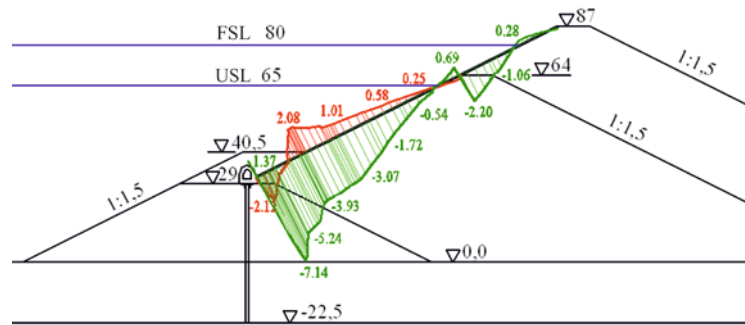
Stresses (MPa) on the upstream face of the reinforced concrete face in the direction along the face
